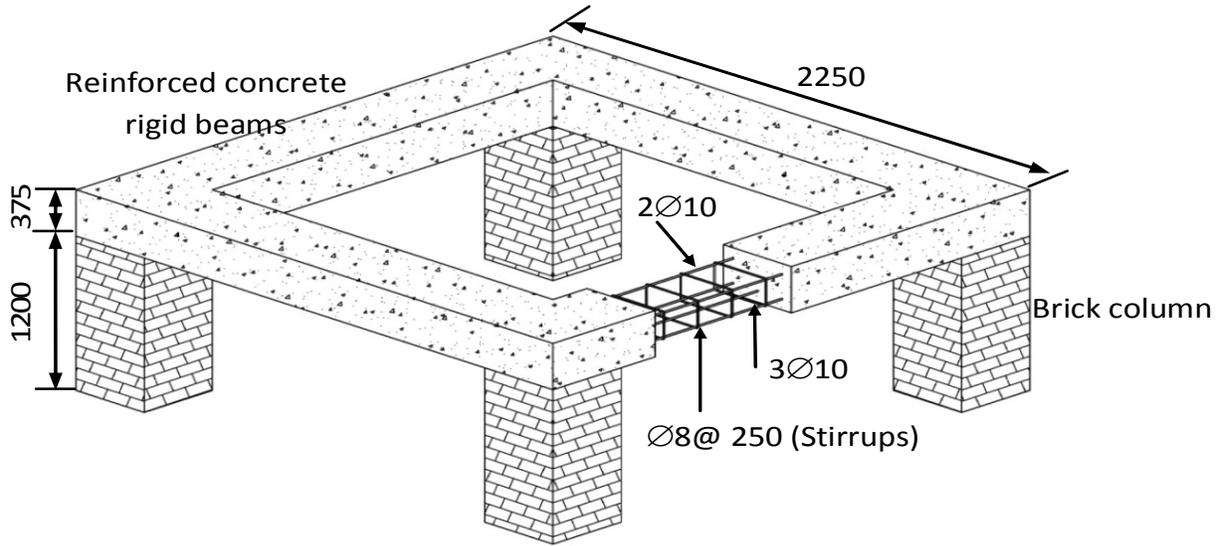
Layout and dimension of rigid beams. Dimensions in mm.
